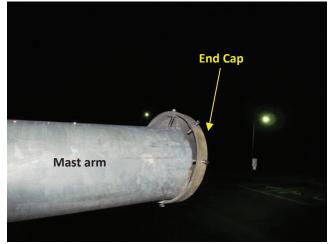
Improperly sized and fastened end cap at end of mast arm
